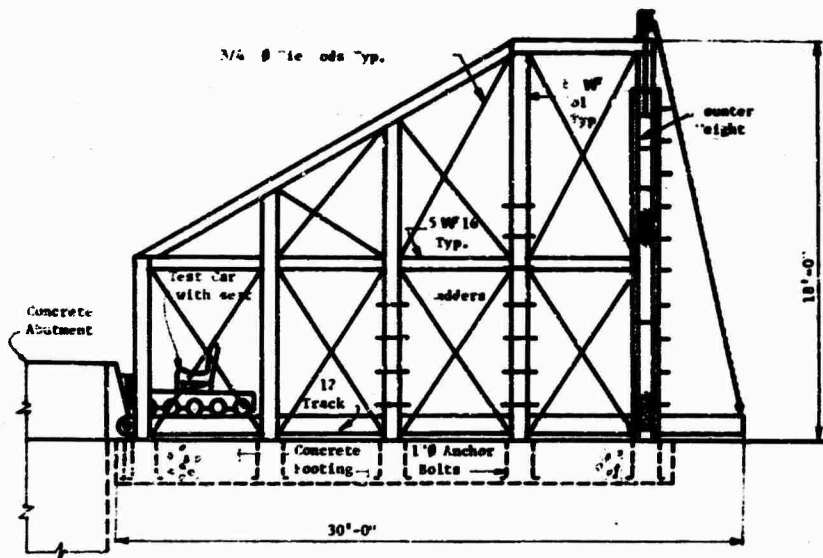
SUPERSTRUCTURE STRUCTURAL ARRANGEMENT
